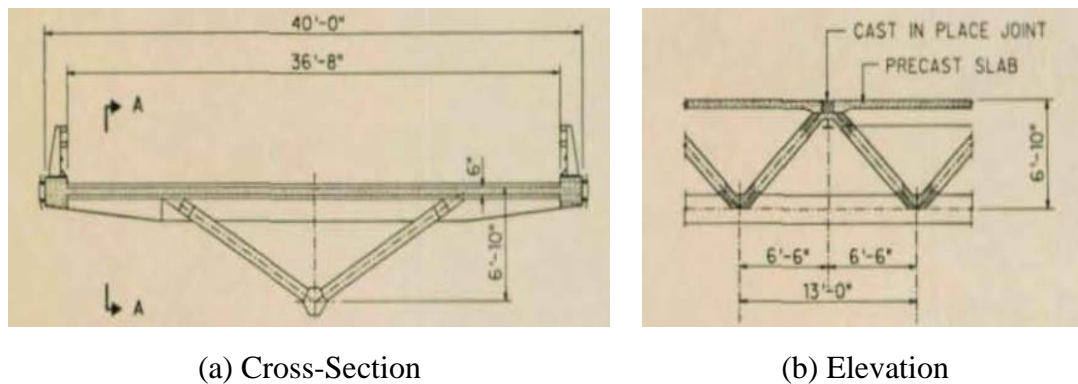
Roize (a) Cross-Section and (b) Elevation View (Muller 1993)
